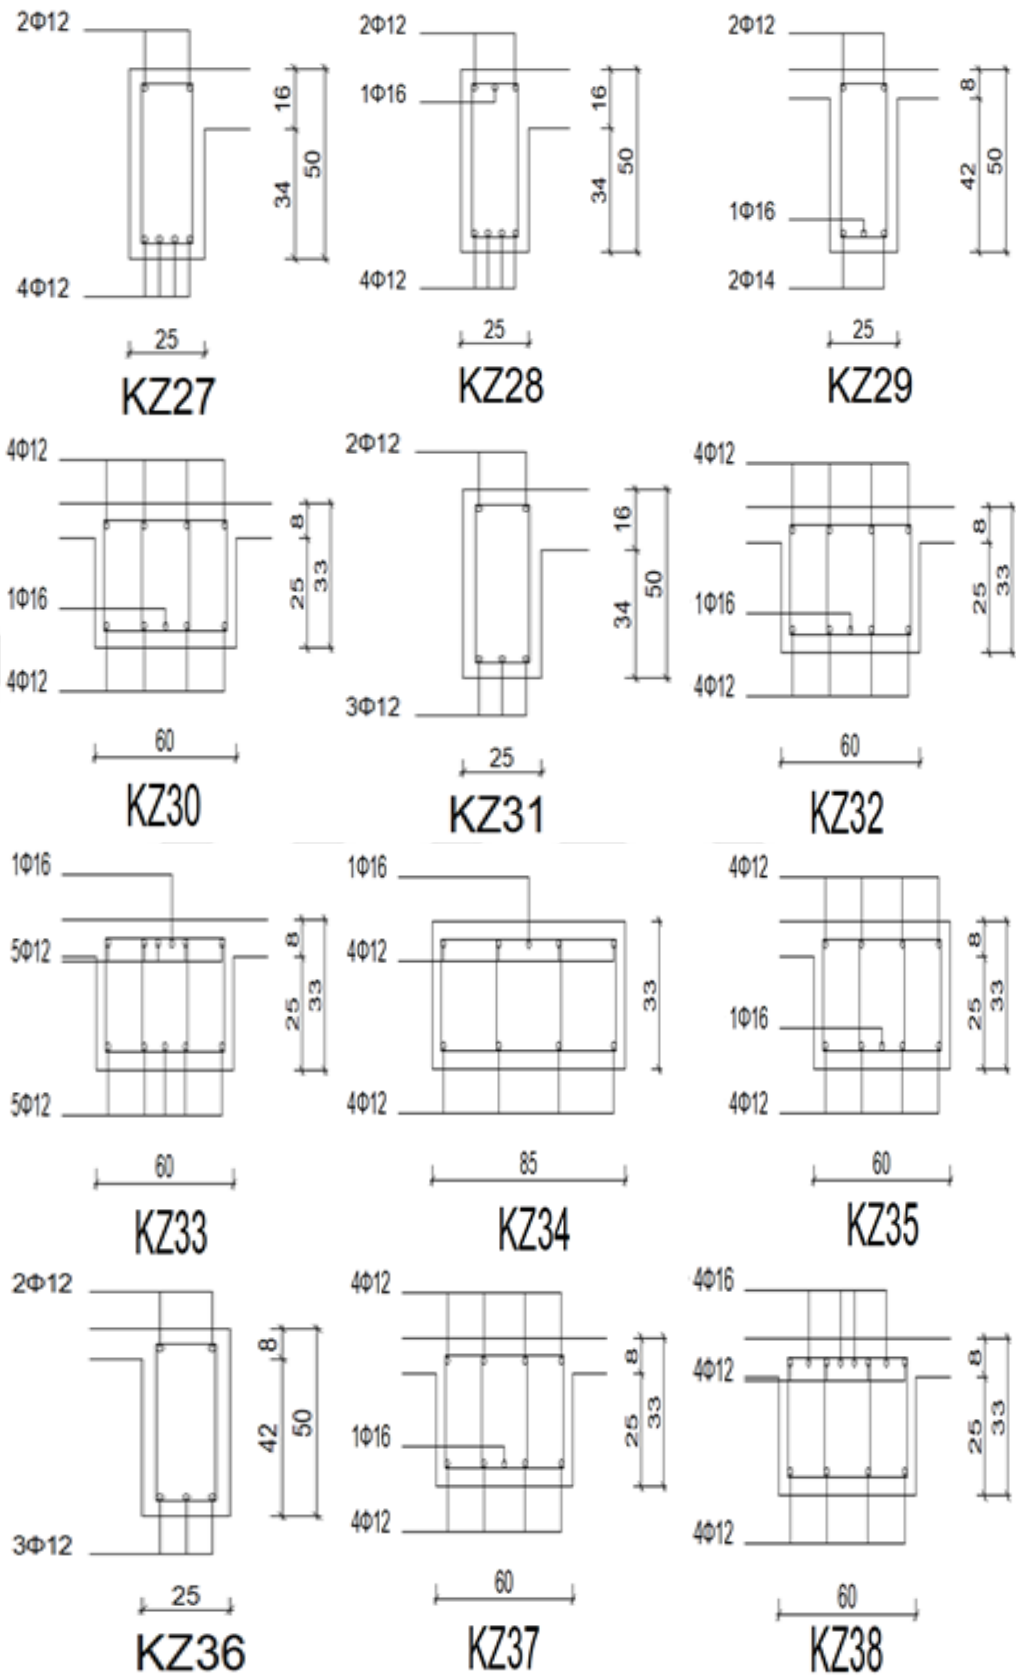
Reinforcement details of beam sections (KZ27-KZ38).
